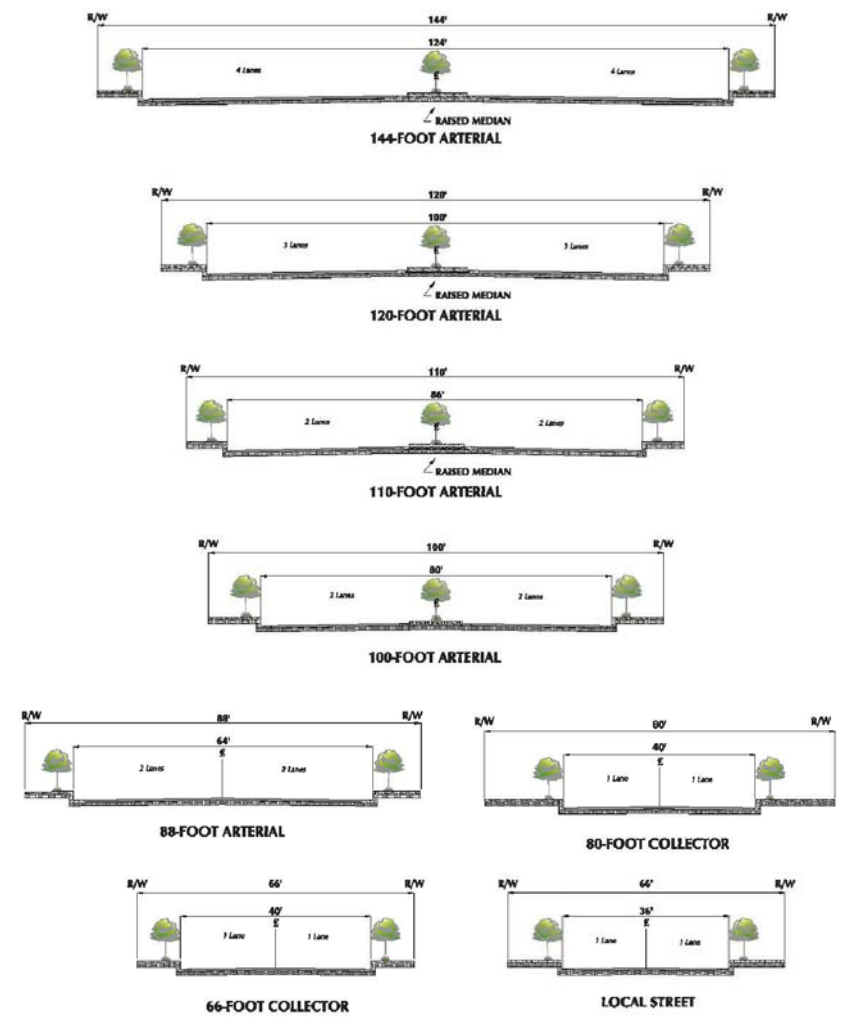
B CITY OF RIVERSIDE MASTER PLAN OF ROADWAYS AND STANDARD ROADWAY CROSS-SECTIONS
